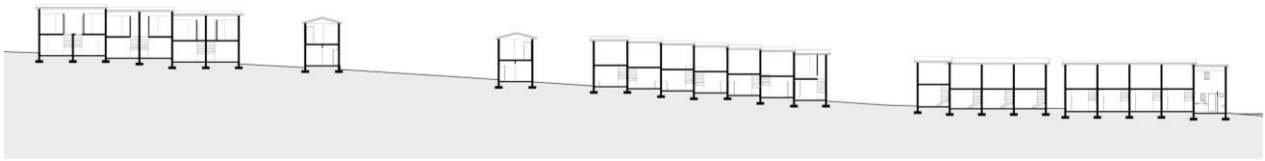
Site 2 Longitudinal Section. Source: Author, 2016.
